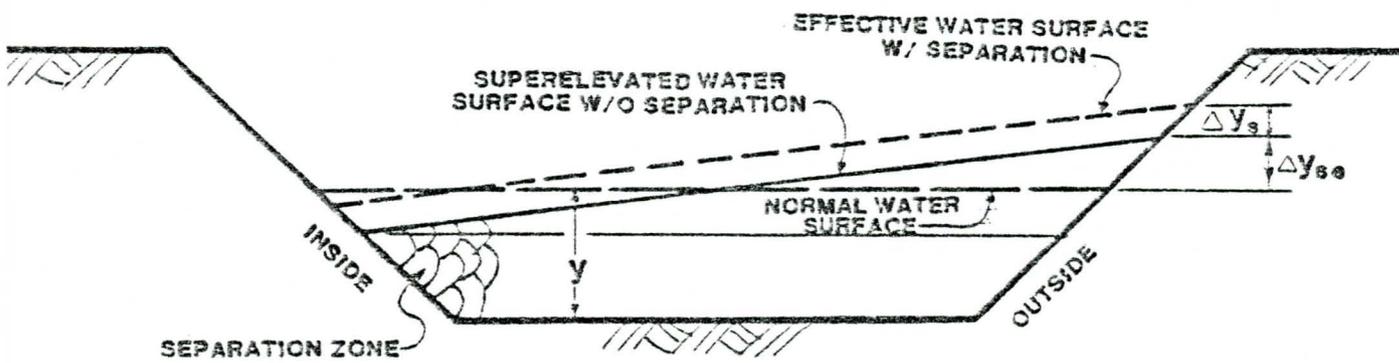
Definition sketch of superelevation and flow separation conditions in a short radius bend.
